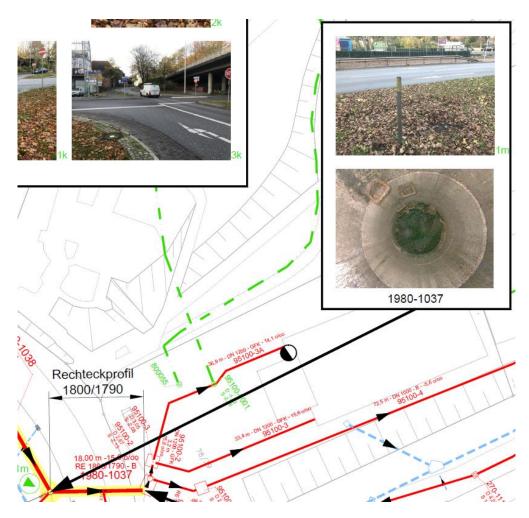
TV-inspection frame for the access manholes and the planimetry
